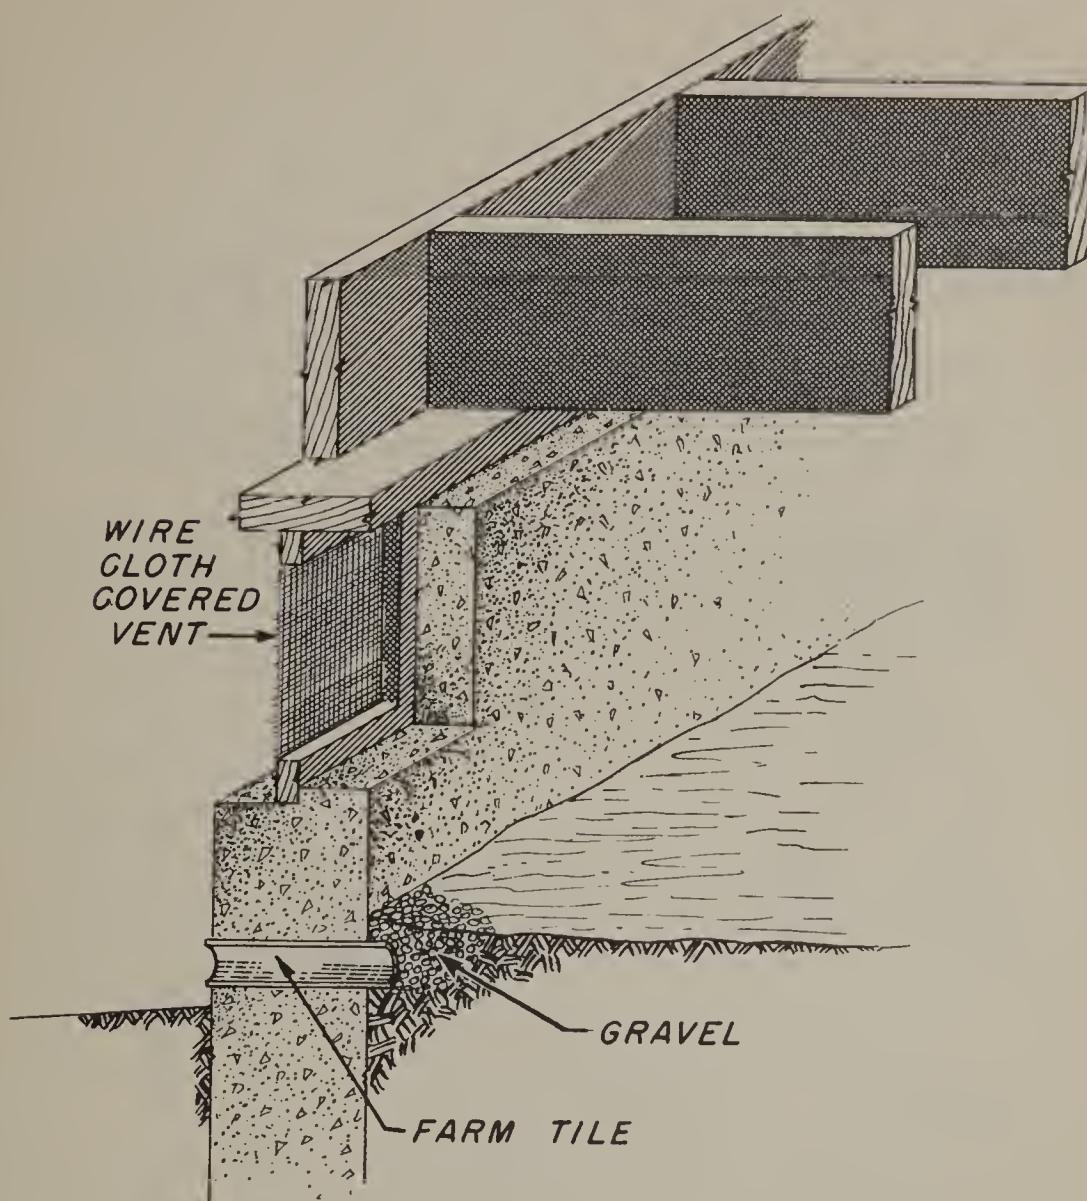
Basementless house, crawl-space ventilation.* The shallow space between the soil and floor joists in basementless houses in some cases may become very damp because of evaporation from the soil surface. Under such conditions a high moisture content will occur in adjacent woodwork and water will condense on sills, joists, and other parts near the outside wall when outside temperatures drop rapidly. Condensation control in this detail depends on ventilation. At least 4 vents should be used and they should preferably be placed near the corners of the building. The net openings required for a given house may be computed as indicated in the section entitled "Good practice recommendations." The openings should be placed as high as possible since there is likely to be less obstruction to interfere with air movement. In northern climates the floor of the living quarters should be adequately insulated so that the ventilators can be left open all the year. If the building is located on a sloping site, drain tiles on the low side are suggested to permit water to drain from the crawl space. Stones piled over the tile opening will prevent the entrance of small animals but will permit water to escape. Plumbing pipes, of course, should be insulated.
